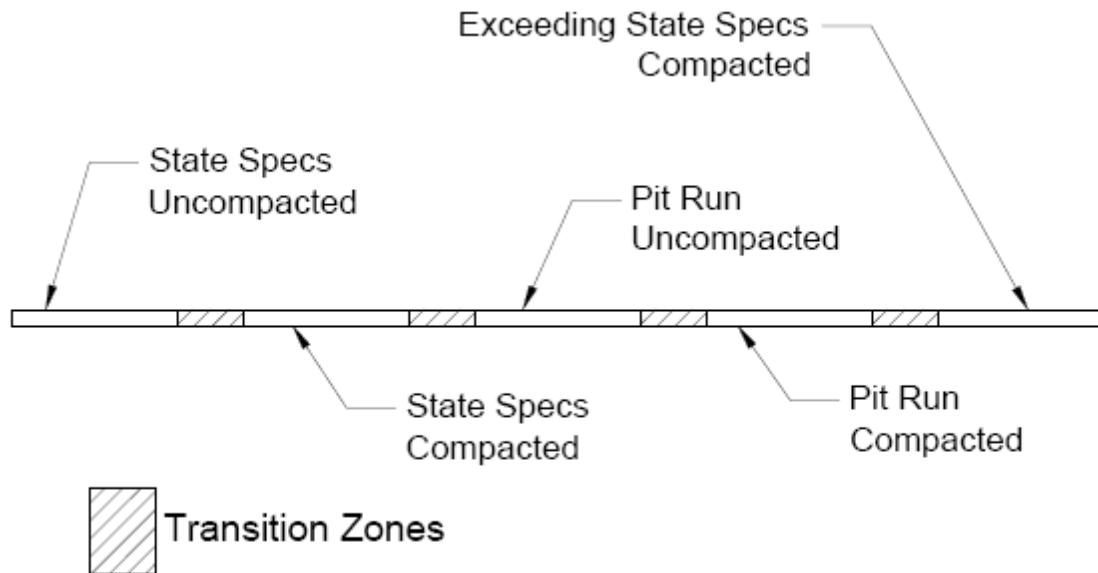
Proposed test site layout showing five 250-ft long test cells with 100-ft transition zones between them.
